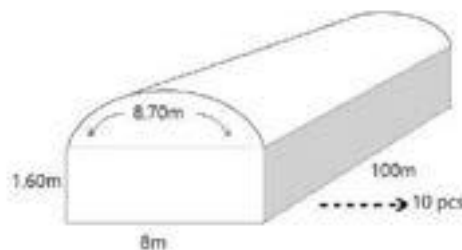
Dimensions of the greenhouse planned to be built. The dimensions of the greenhouse planned to be established are given in Fig.1. This greenhouse will be built with 10 parabolic roofs adjacent to each other. An area of 80 meters wide and 100 meters deep will be covered. For this covering, polyethylene film, which is widely used and easily available in most greenhouse applications in the region, will be used. The average night temperature in the region's coldest season is around 0 degrees. The night temperature for greenhouse plants is stated as 14-18°C degrees. The aim is to keep the inside of the greenhouse at 16°C degrees. Heat loss calculation was made according to all these values. Heat loss coefficients for polyethylene film greenhouses are given in table 1. The heating period at night is planned to be 12 hours. Heat loss calculation for these values was made using equation (1).
